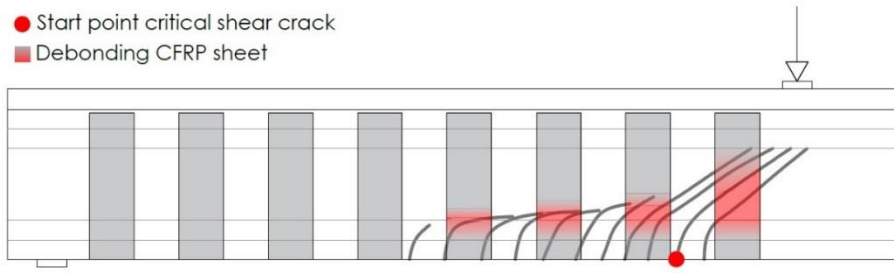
Debonding CFRP sheets specimen I-V-SP5 at load step 51
